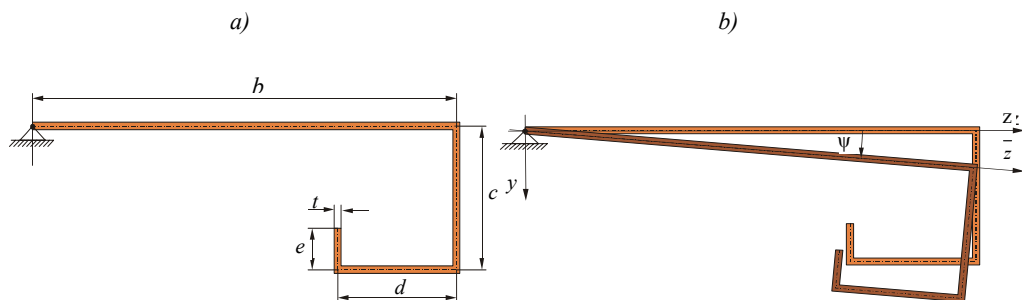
Schemes: a) cross section of the flange, b) displacement of a buckled flange
